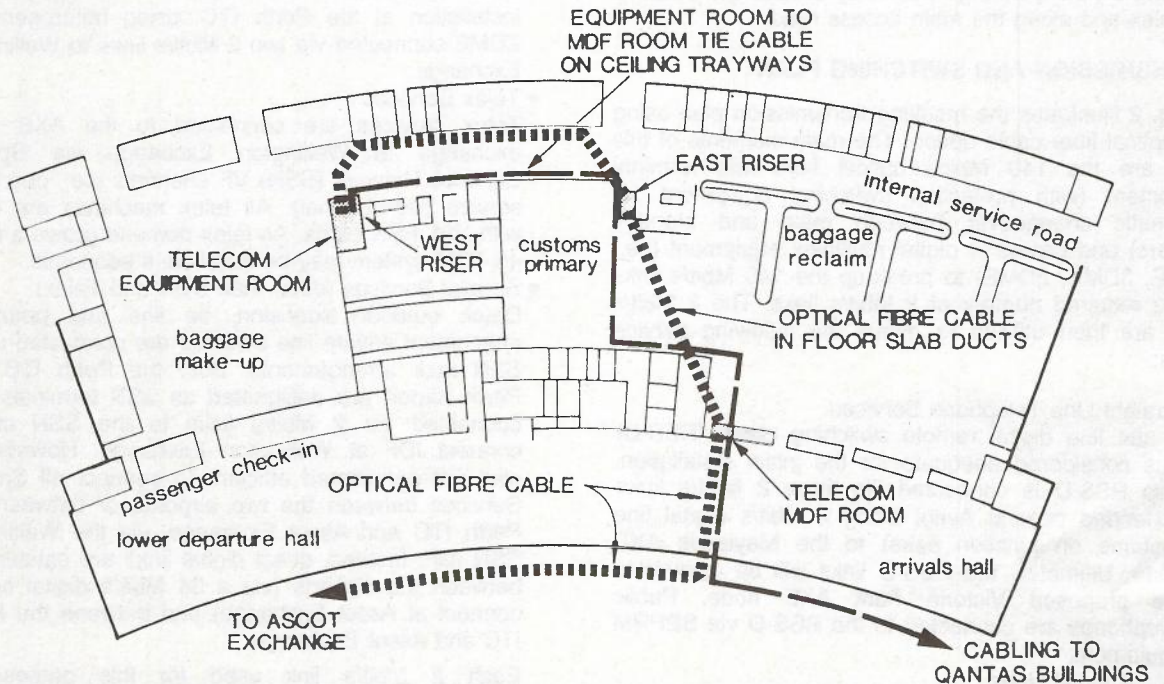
Perth ITB, ground floor plan, showing the location of the Telecom Equipment and MDF Rooms.
